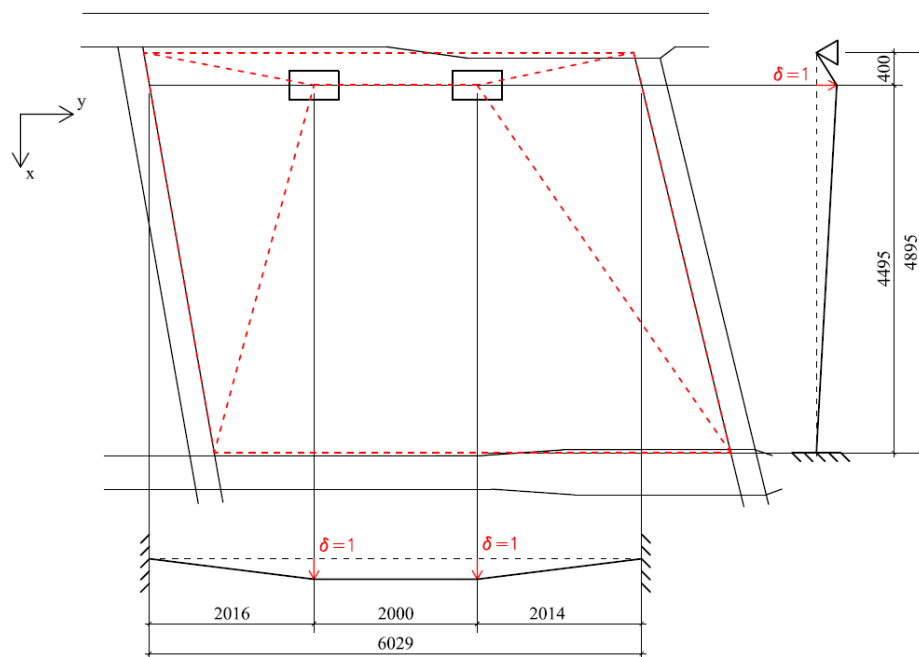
Yield line pattern for the bridge deck slab; all dimensions are in mm.
